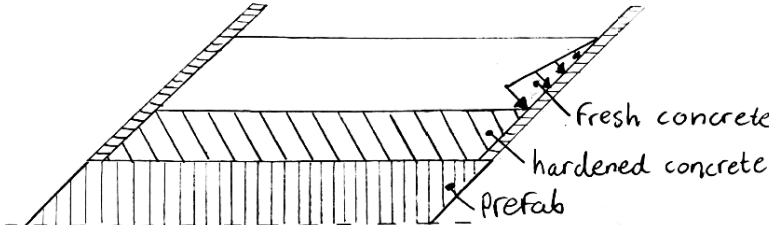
Concrete pressure of fresh concrete onto the formwork. The concrete between the prefab element and fresh concrete is yet hardened.
